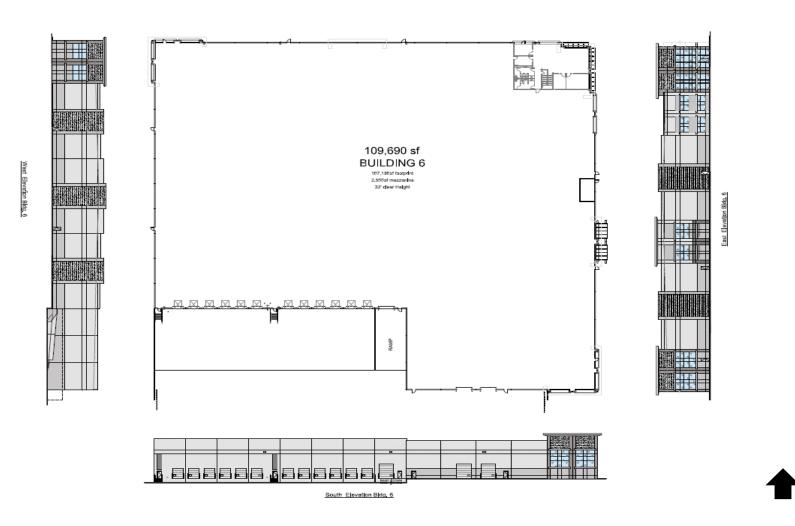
Exhibit K (Building 6) - BUILDING FLOOR PLAN AND ELEVATIONS
